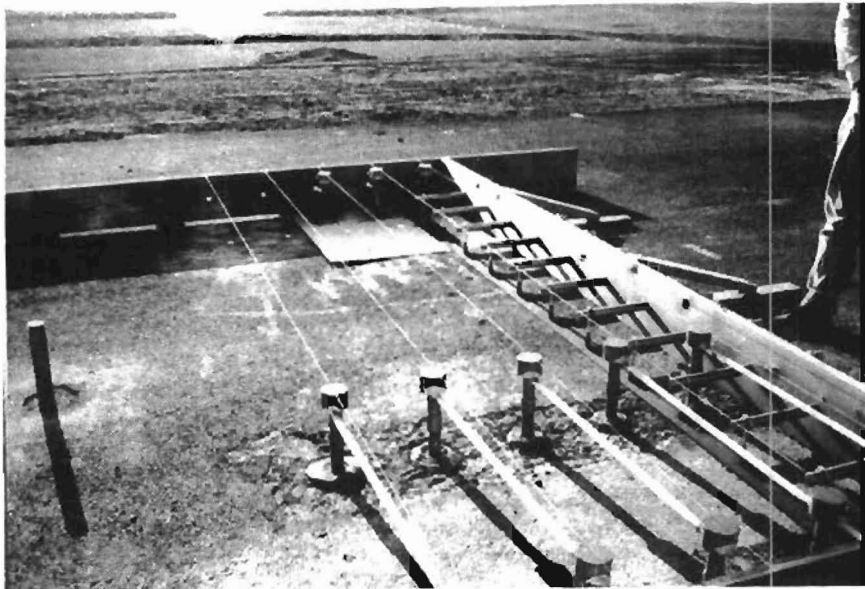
DCDT holding units in place before pouring of the concrete.
